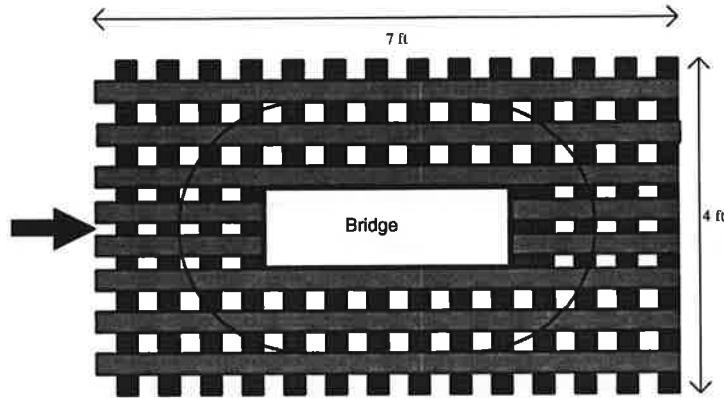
Placement of grout filled bags around the rectangular pier for series MC-GB4, MC-GB5 and MC-GB6.
